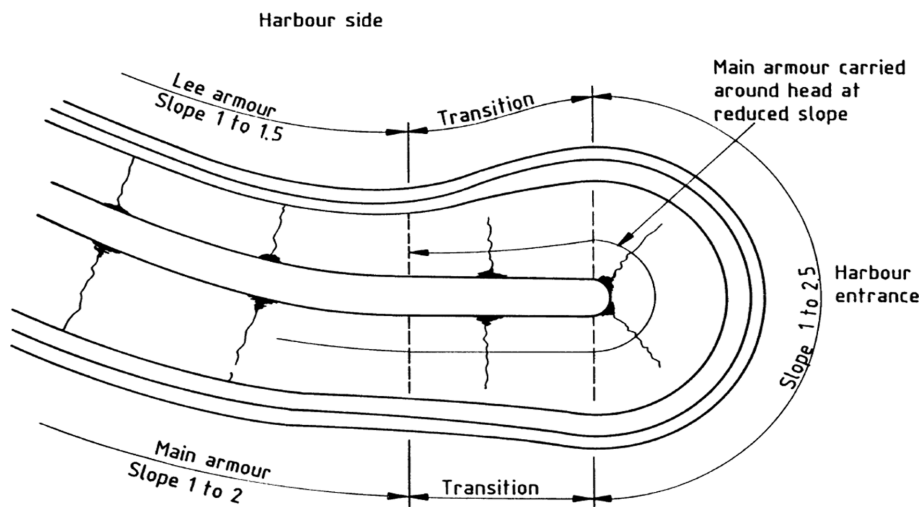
Typical layout of breakwater roundhead (BS, 2000).
